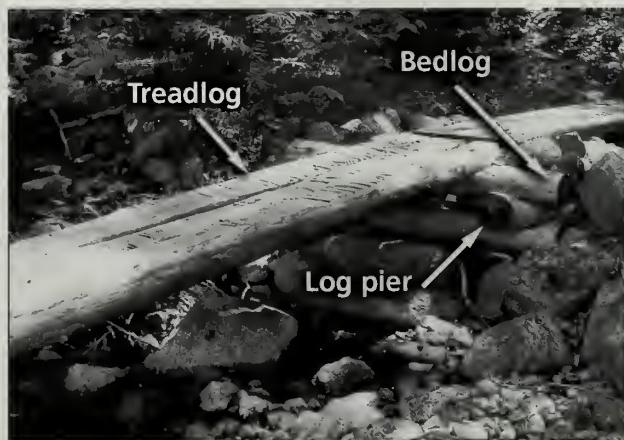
A bogwalk bridge supported by a log crib on the Pond Trail (#20).
